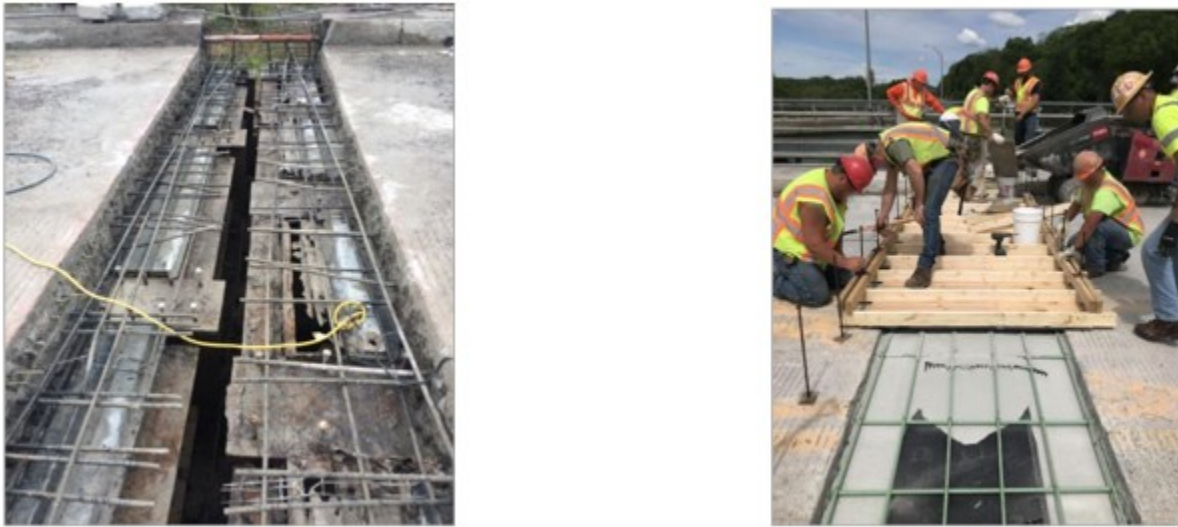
Concrete Deck and Joint Removed before Link Slab Installation and Forming of Link Slab [12].
